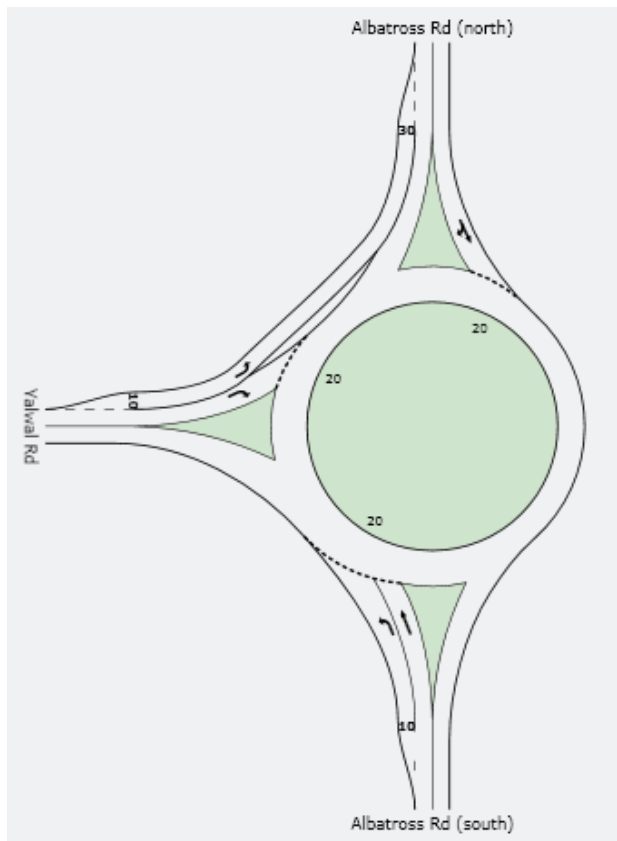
Albatross Road / Yalwal Road Proposed Intersection Configuration
